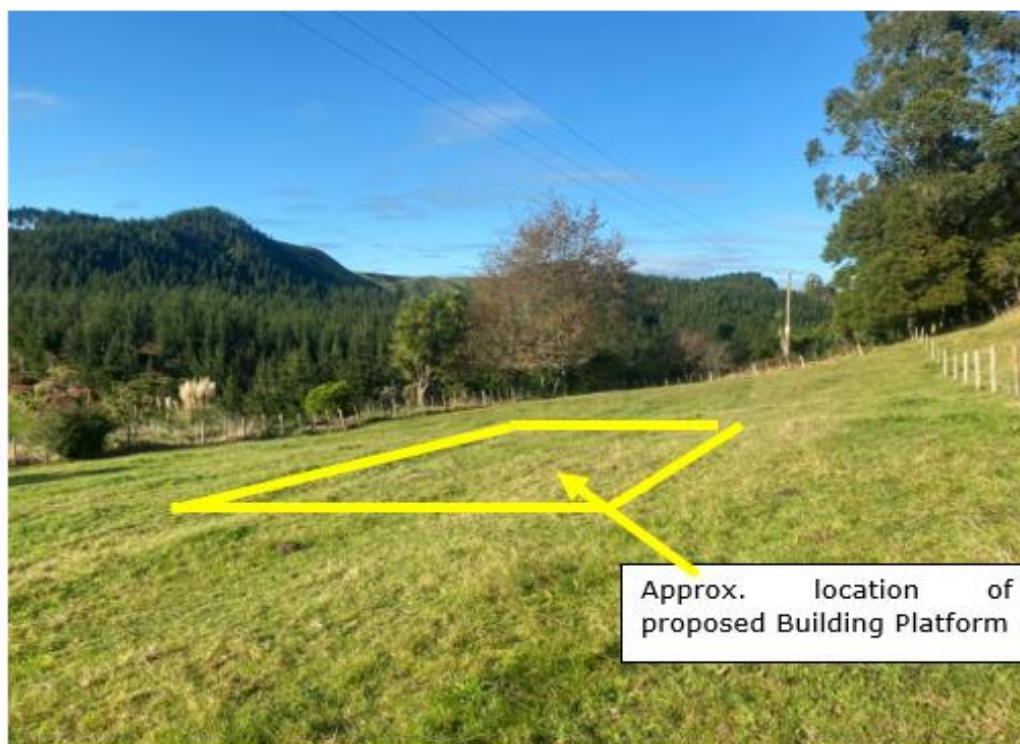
Showing view looking south across the proposed Building Platform on the proposed Lot 2
